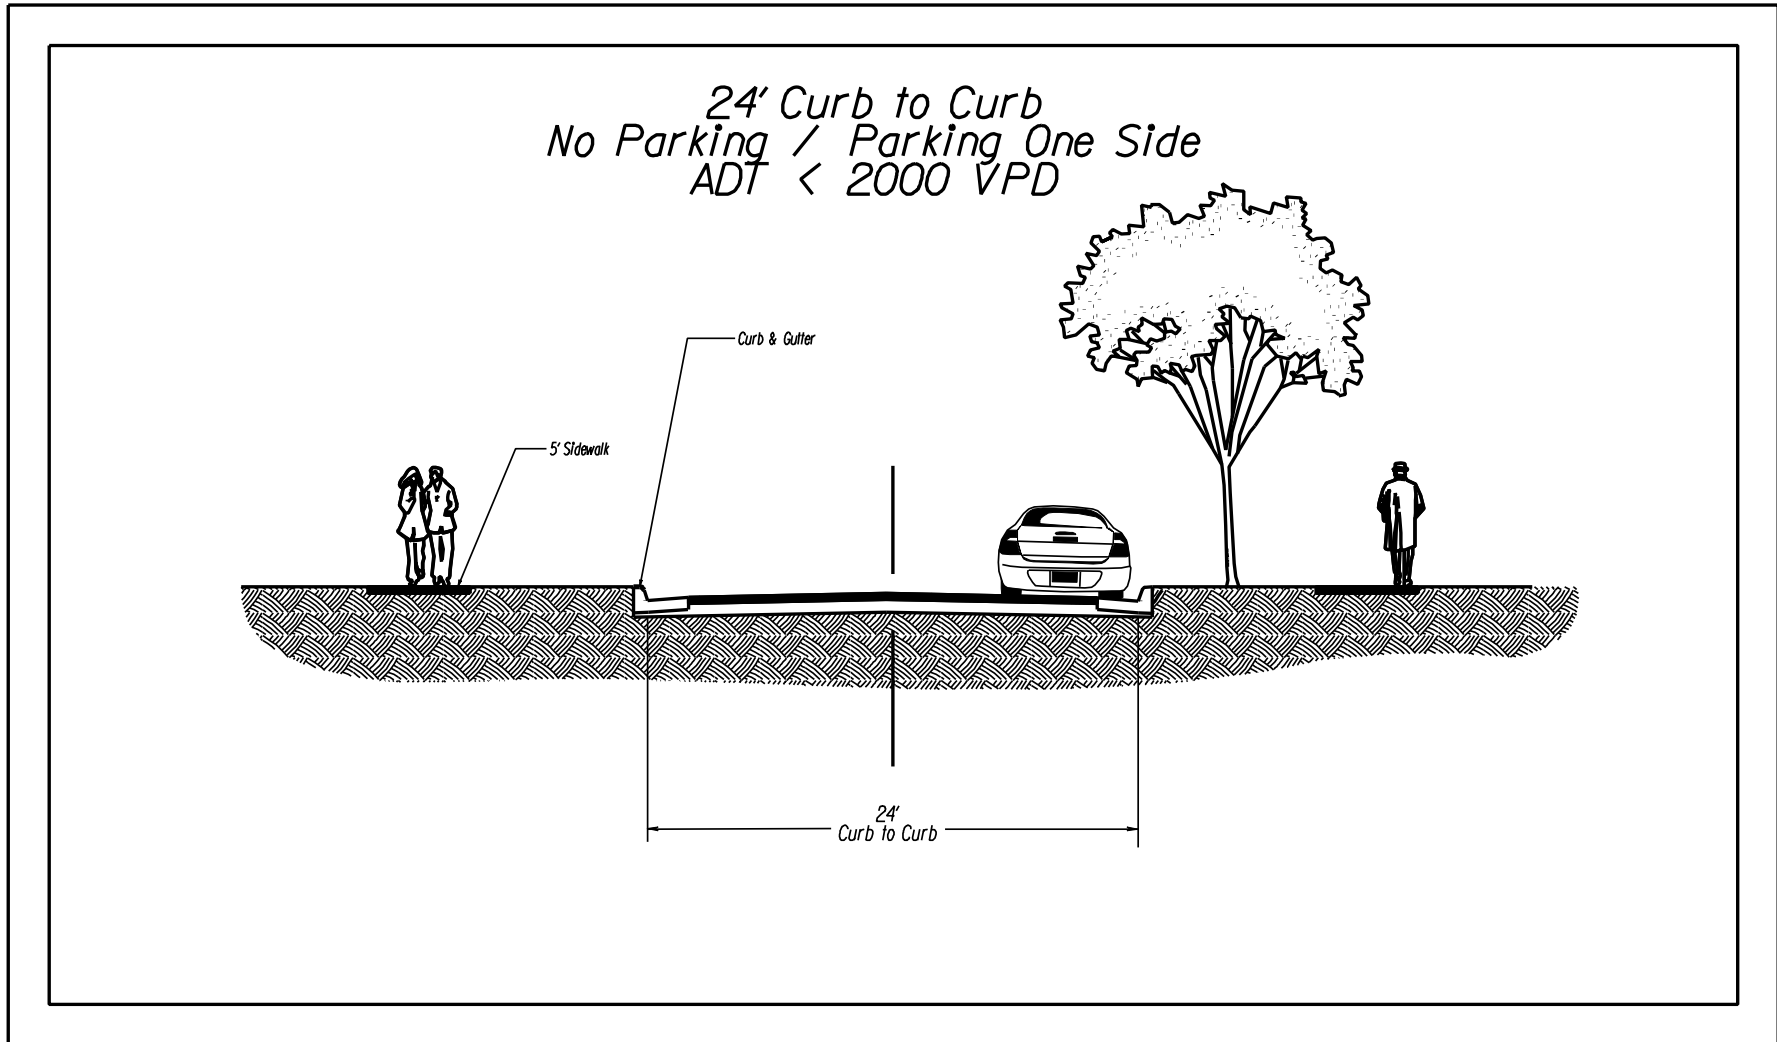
24' CURB TO CURB NO PARKING / PARKING ON ONE SIDE
